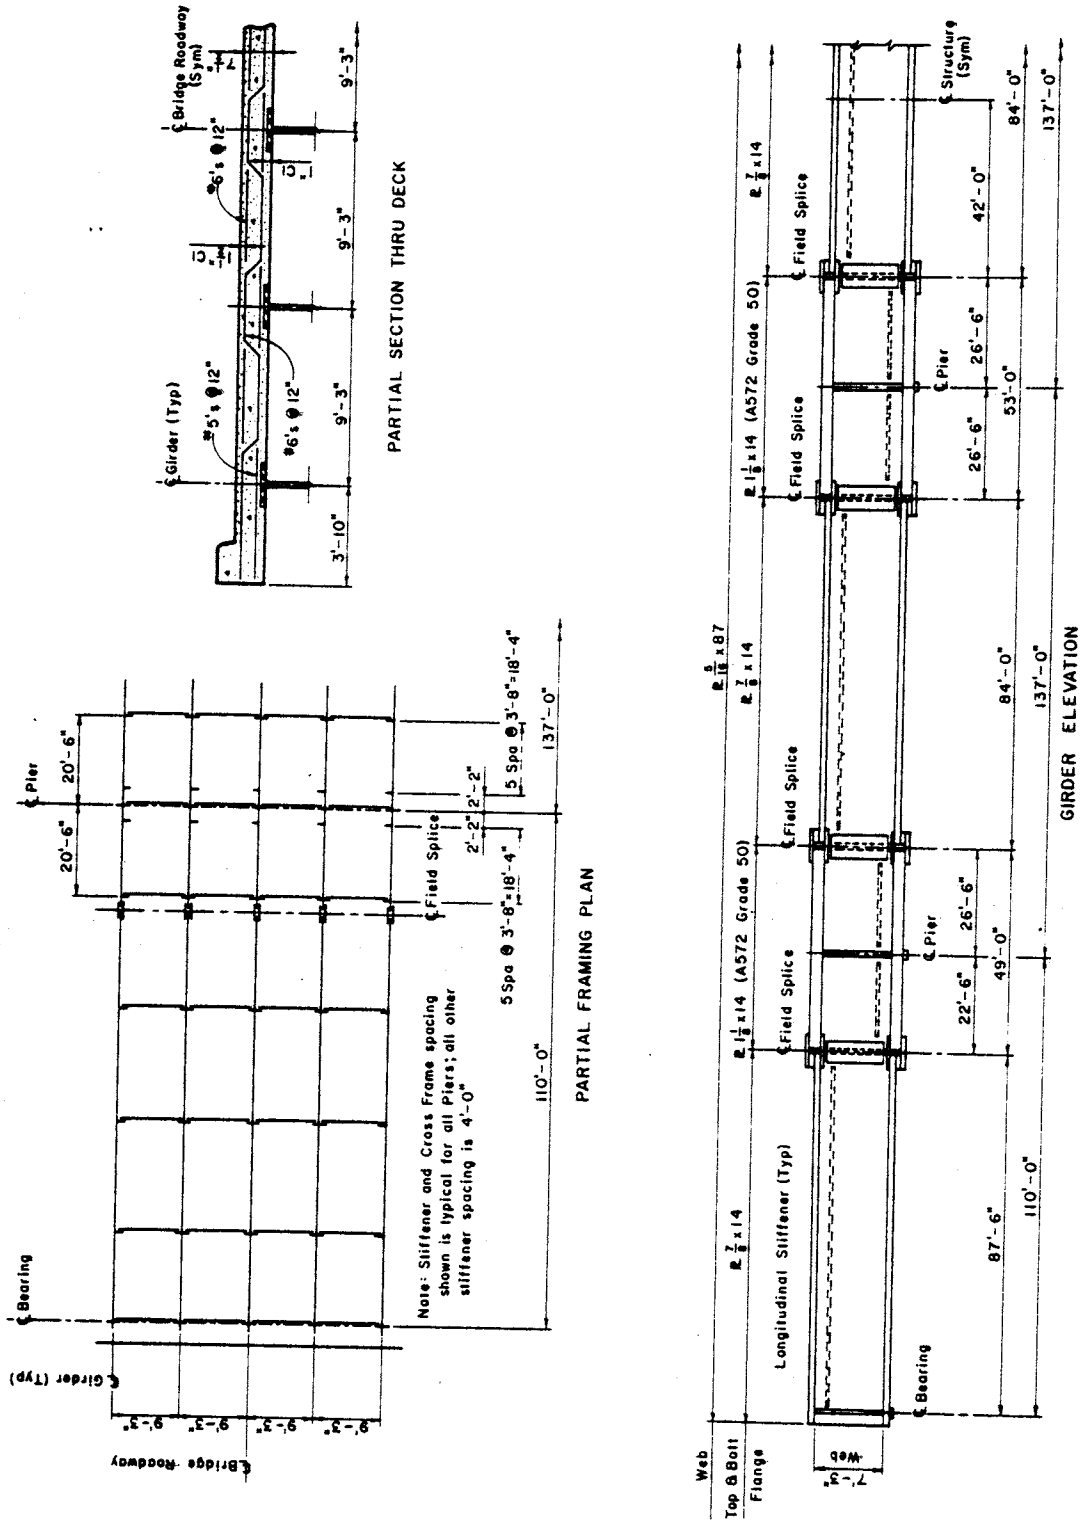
Sample Problem: five-span, welded plate girder bridge. (4)
